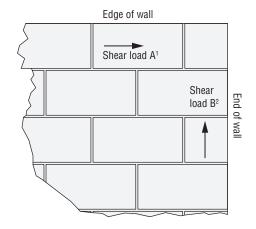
Direction of Shear Load in Relation to Edge and End of Wall
